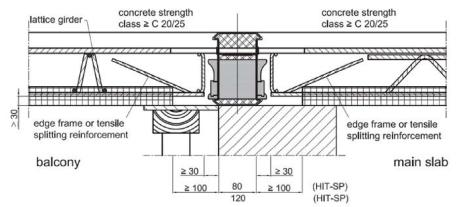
Example of the connection HIT-HP/SP MVX to element slabs with statically effective in-situ layer
